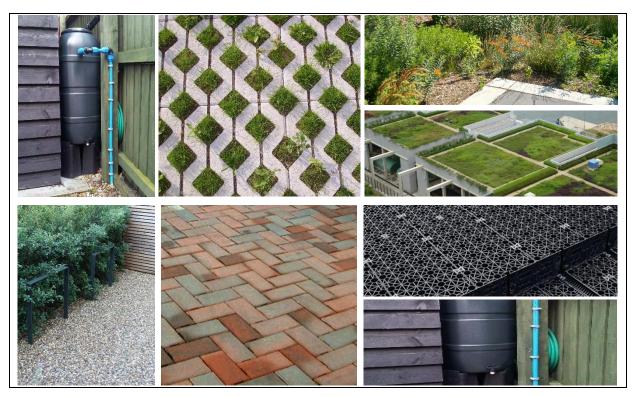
Surface water storage facilities and potential SuDS features - rainwater harvesting, on-site tank storage, rain garden soak-away and green roofs. (Source: UK SuDS Manual)
